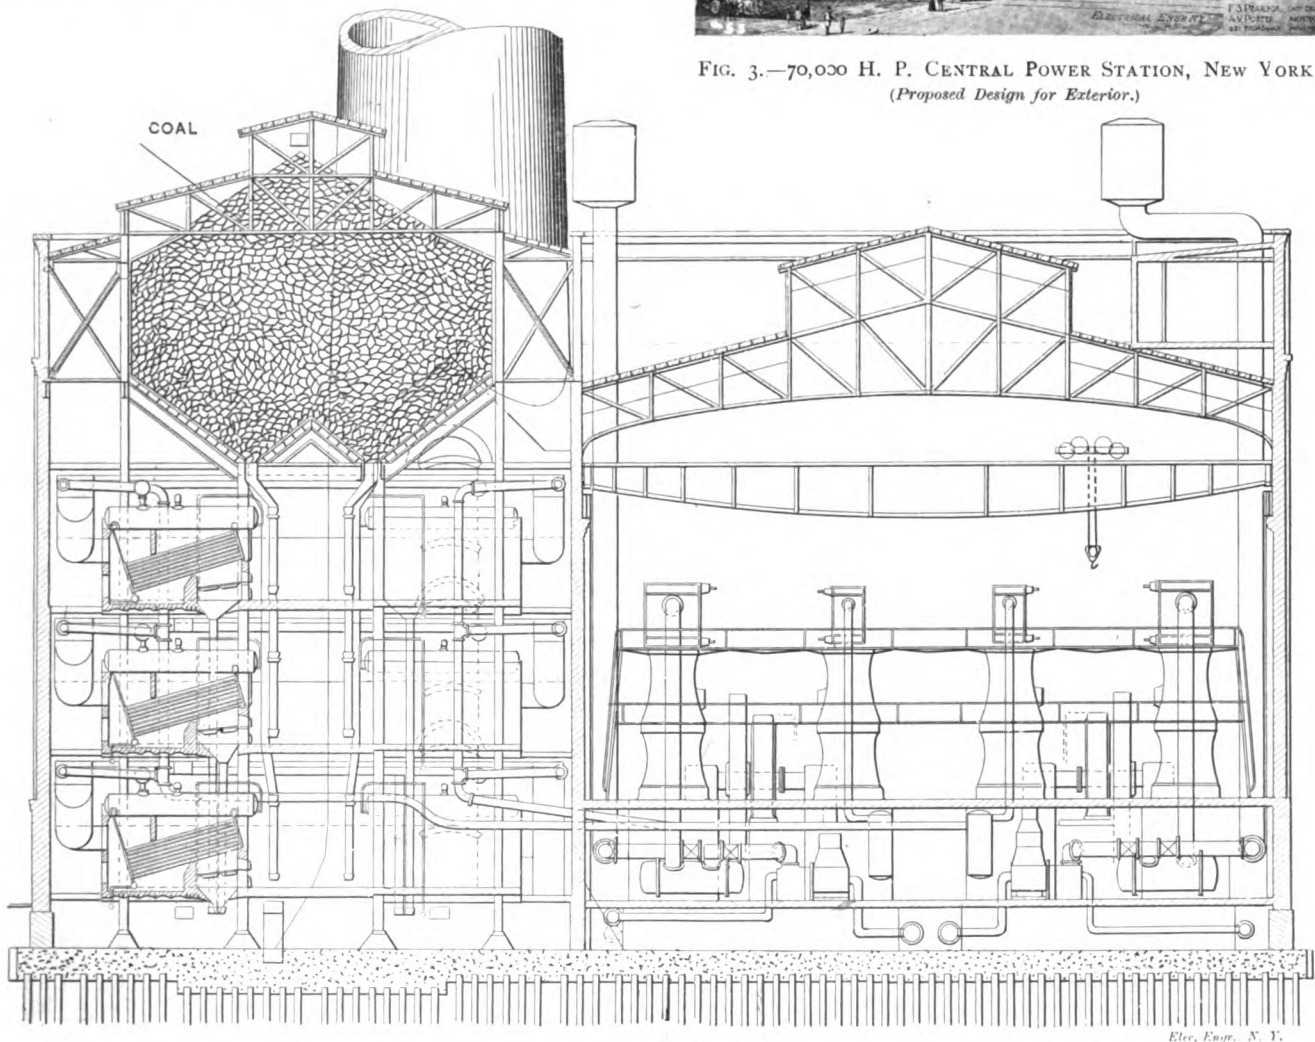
70,000 H. P. CENTRAL POWER STATION OF THE METROPOLITAN STREET RAILWAY CO., OF NEW YORK.—TRANSVERSE SECTION.
